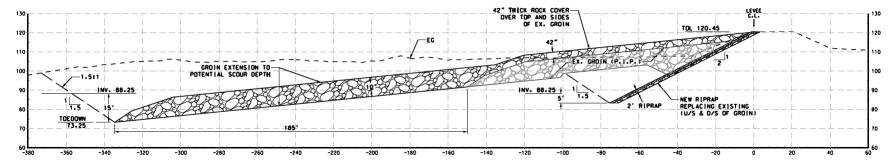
Typical Cross Section of Alternative E (Sta. 368+00)
